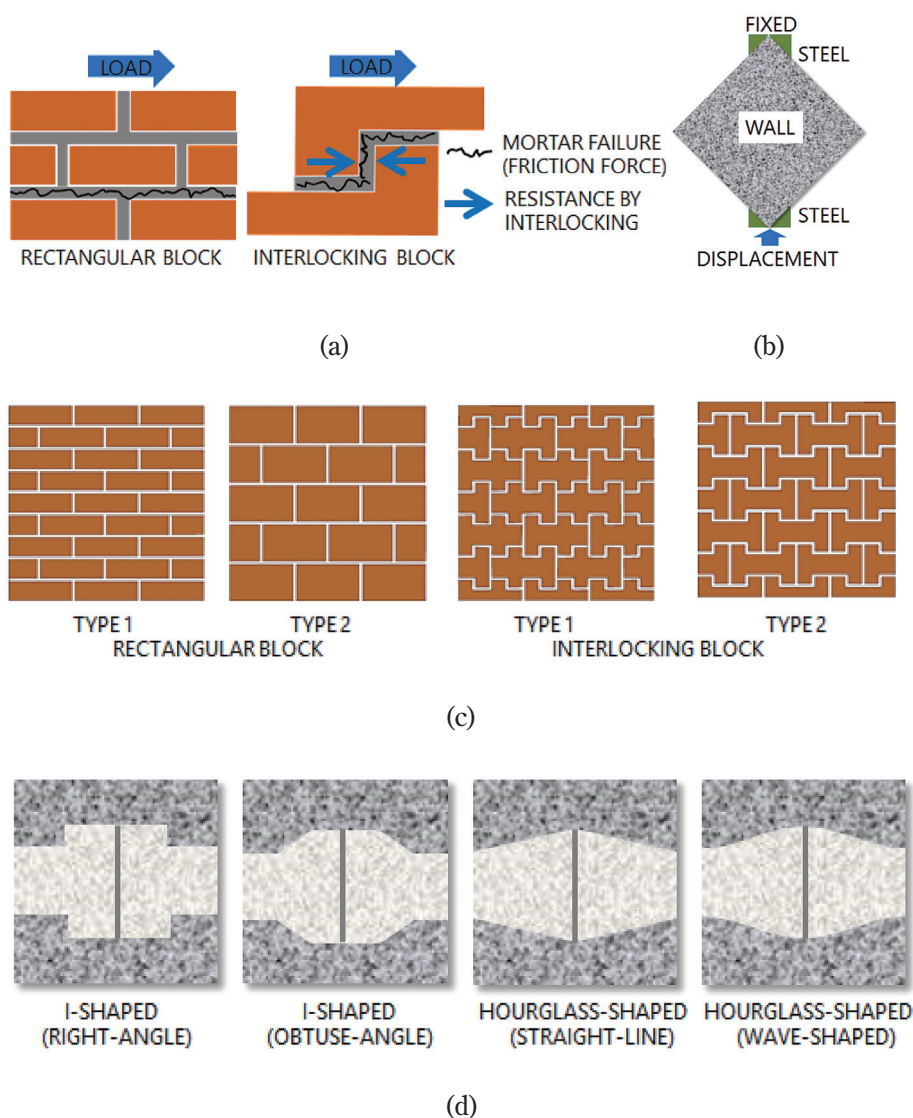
Diagonal compression tests on interlocking masonry walls carried out in previous studies: (a) difference in the resistance mechanism against lateral load between a masonry wall made with rectangular blocks and a masonry wall made with interlocking blocks; (b) diagonal compression test; (c) rectangular block wall and interlocking block wall test specimens (Furukawa et al., 2018a); (d) test specimens of interlocking brick walls with various block shapes (Furukawa et al., 2018b).
